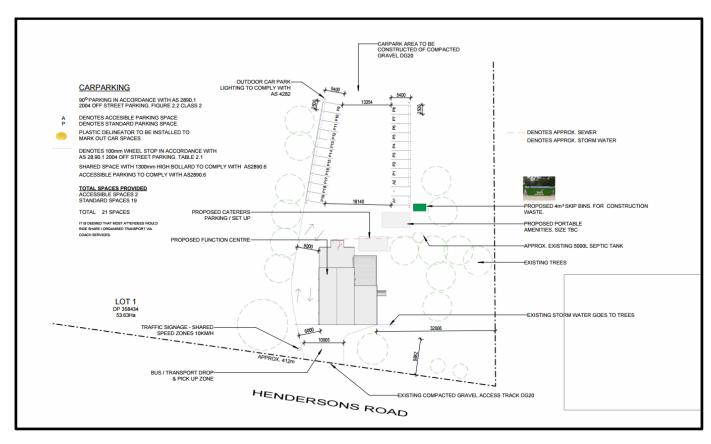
Proposed Site Plan Function Centre – Lot 1 (Source: Reward Character Designs)
